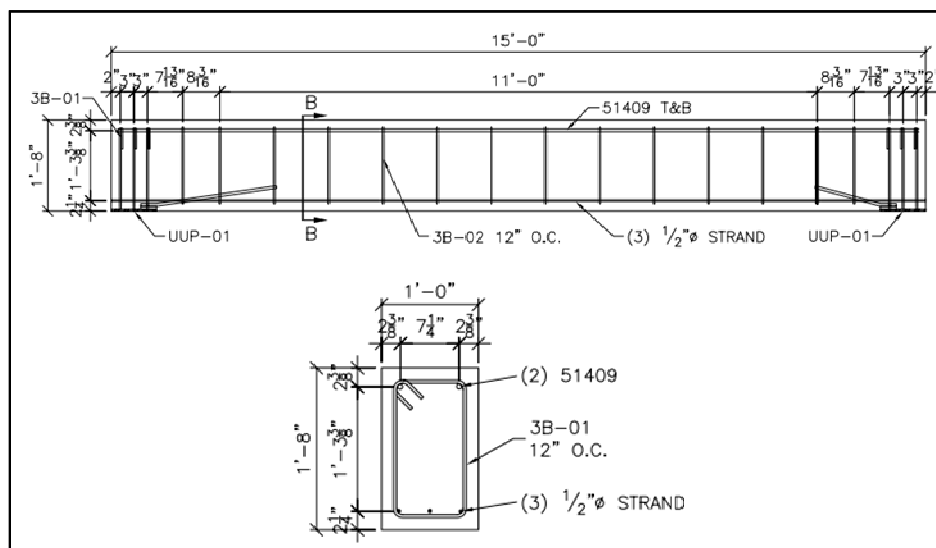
Reinforcement layout for specimens P2, RP1, and RP3
